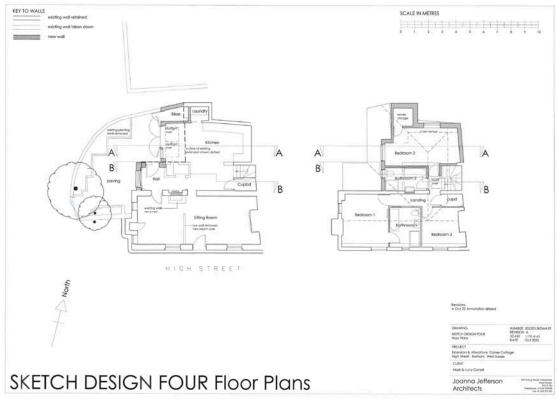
Proposed plan for the extension of Corner Cottage (Joanna Jefferson Architects, 10/2022)
